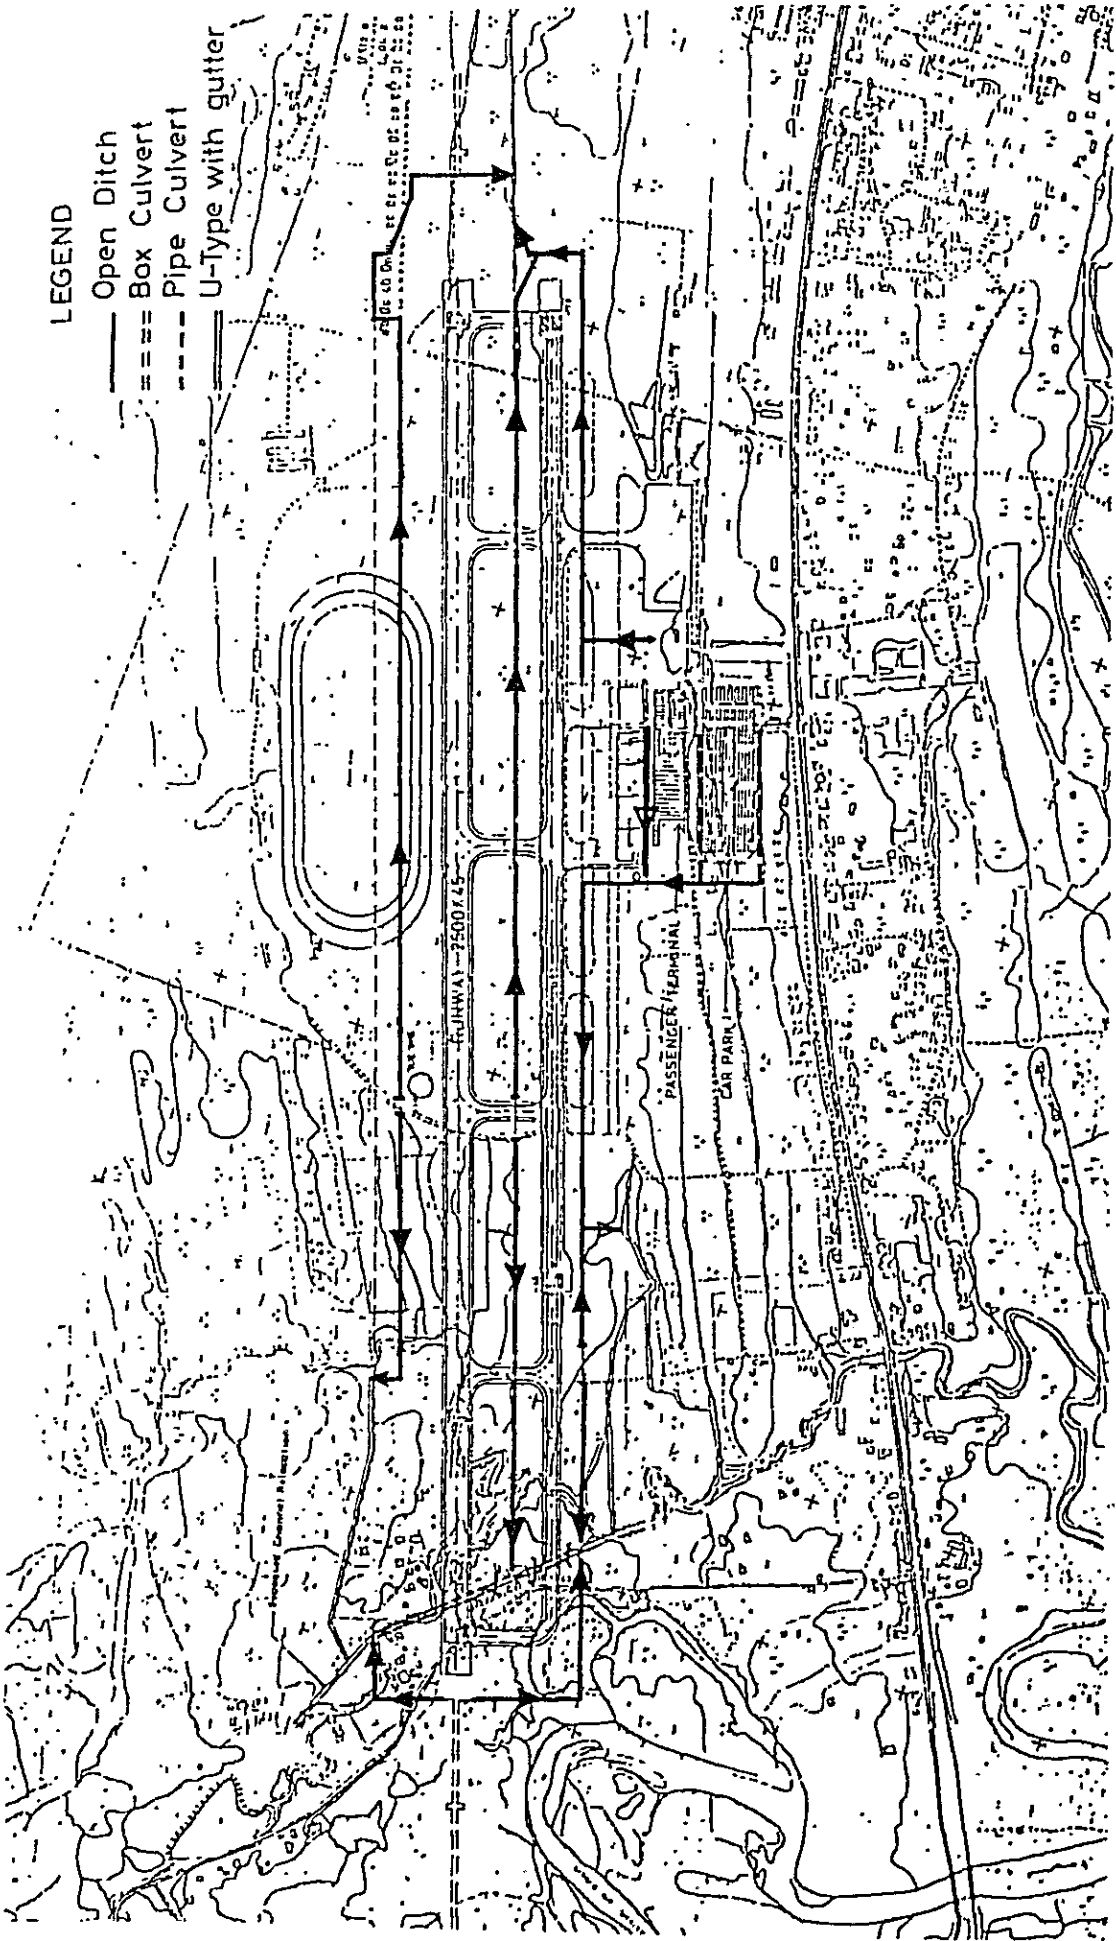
DRAINAGE SYSTEM AT TABING AIRPORT
